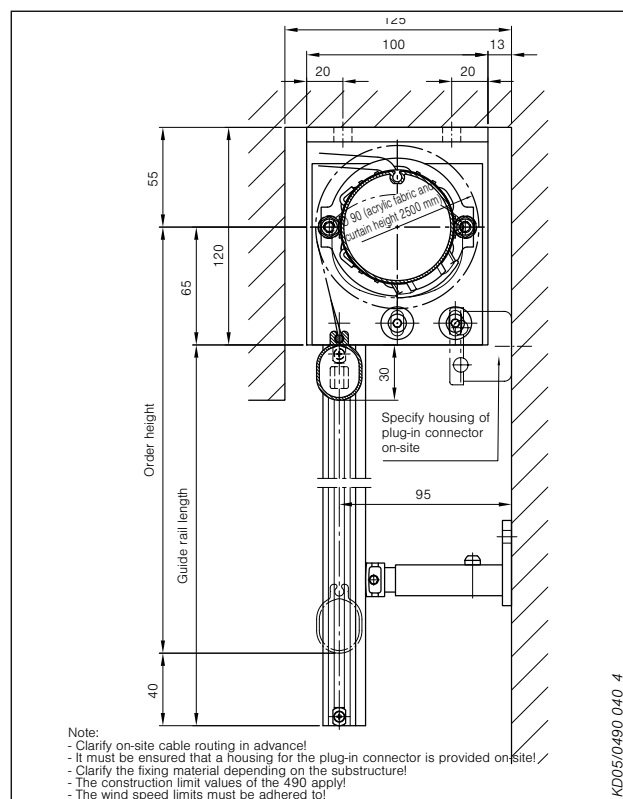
Vertical awning 491 with motor, right rolling blind with guide rails and ceiling installation
